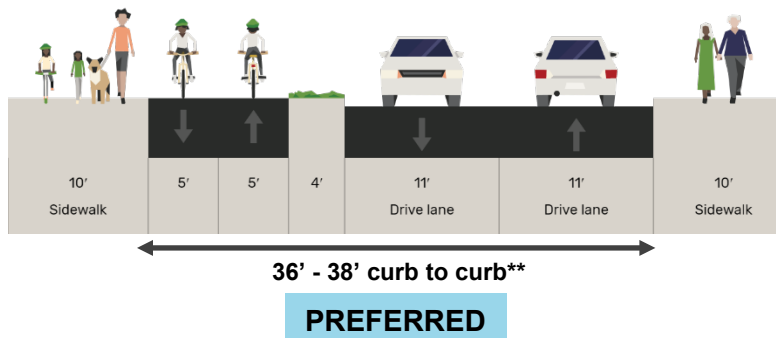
Section B (Butler Street – Sawyer Street to 62nd Street) – Proposed Option 1
